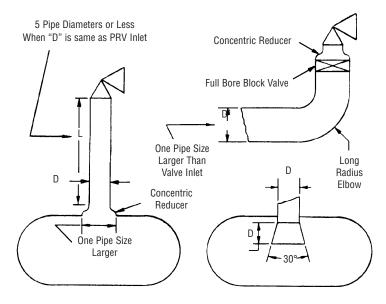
Recommended Tank Penetrations and Inlet Piping Designs
